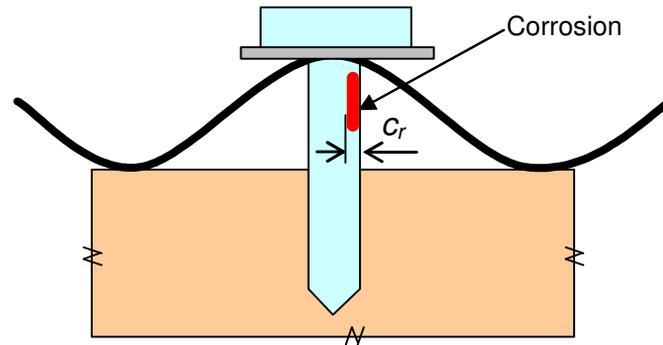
Depth of corrosion on exposed part of fasteners under corrugated roofing
